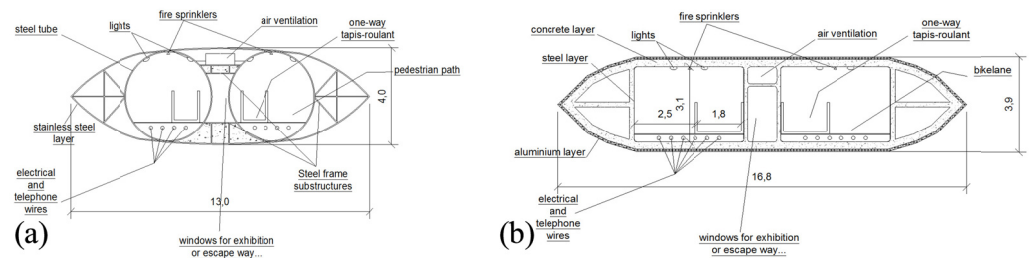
Tunnel cross-sections proposed for the AB connecting Pangangg and Pramuka islands of the Pulau Seribu archipelago (Indonesia): (a) steel tubes framed into an external steel shell; (b) steel-concrete-aluminum layered structure.
